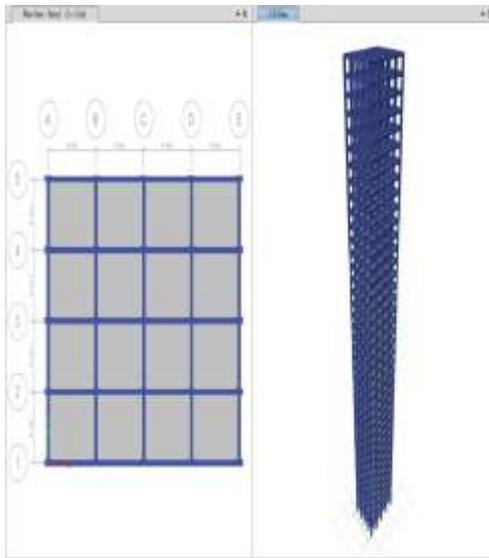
Plan And 3d View of Structure of 40 Storey in ETABS
